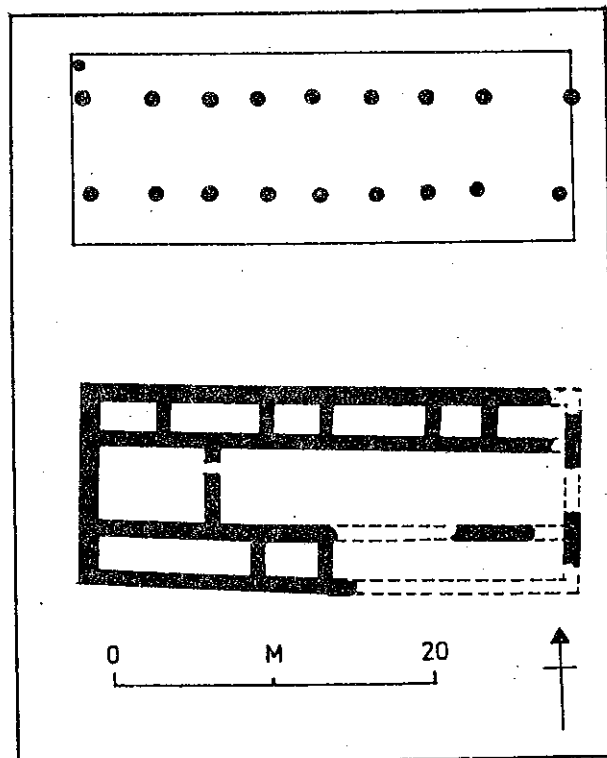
Two successive buildings at Denton. The upper was an aisled timber barn, overlain in the late 4th century by a building with stone foundations, which preserved the original plan and dimensions but partitioned the aisles.
